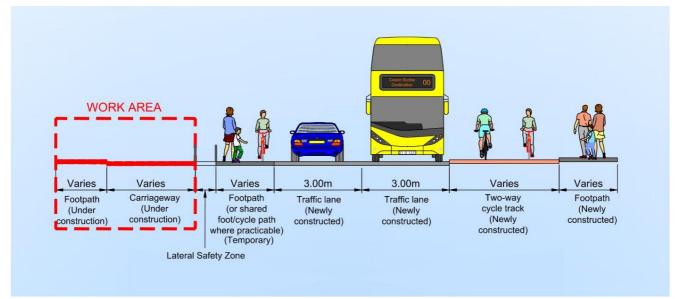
Traffic Management Cross Section, Section 1j – Stage 2
